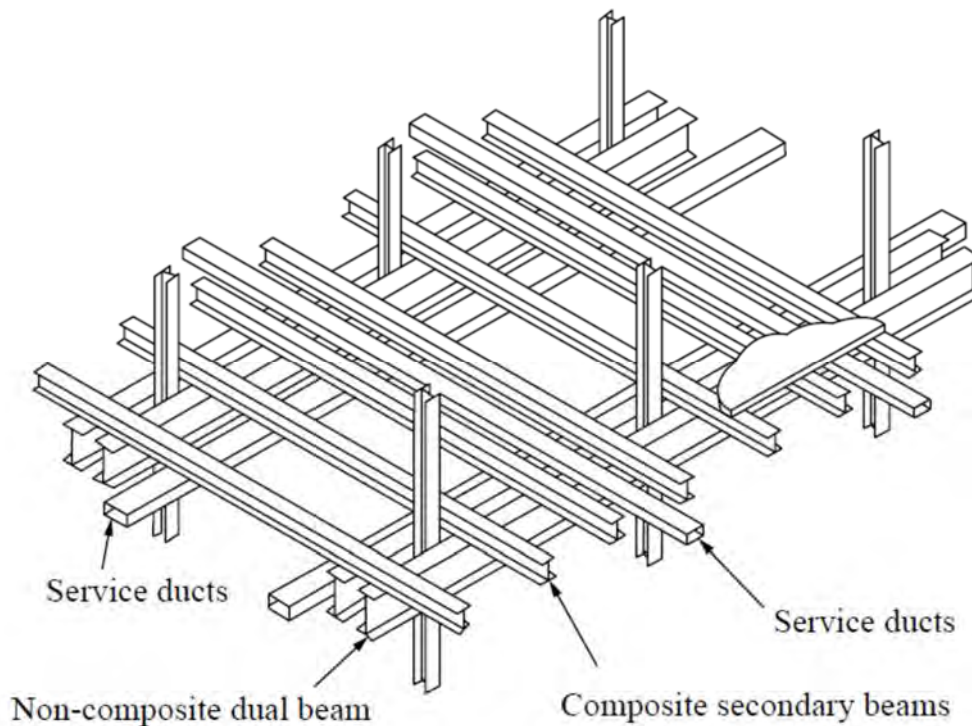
Parallel Composite Beams (Uy and Liew 2002).
